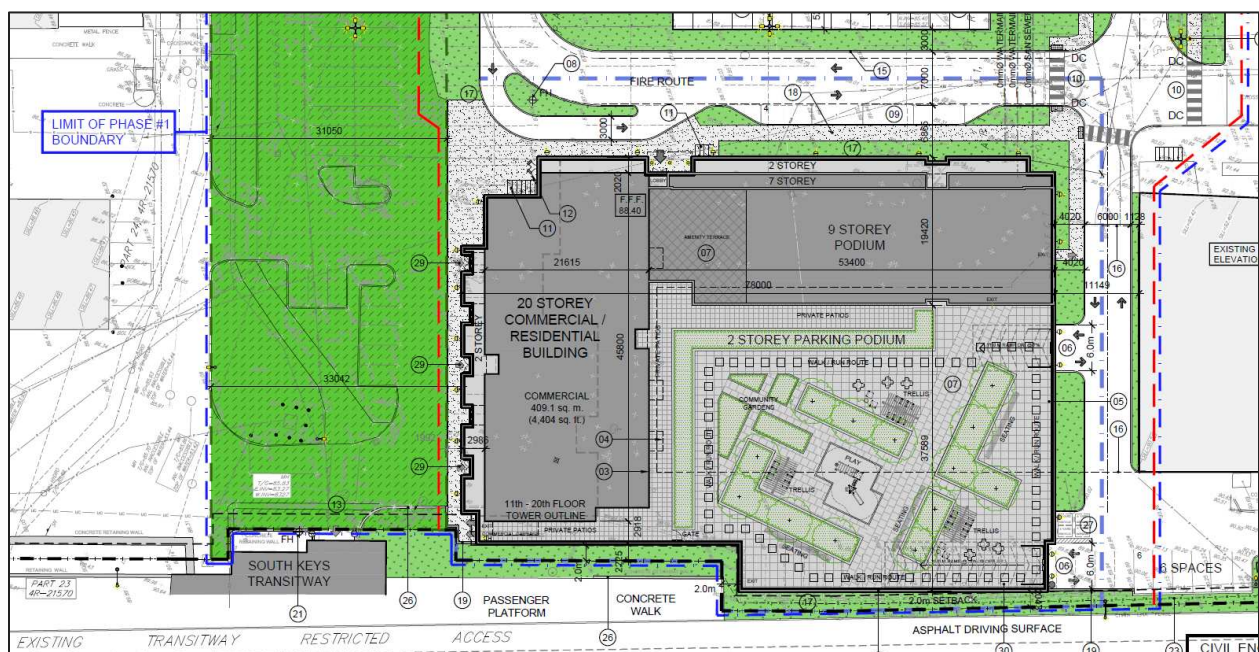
Site Plan excerpt displaying the proposed PH1 building (RLA Architecture)
